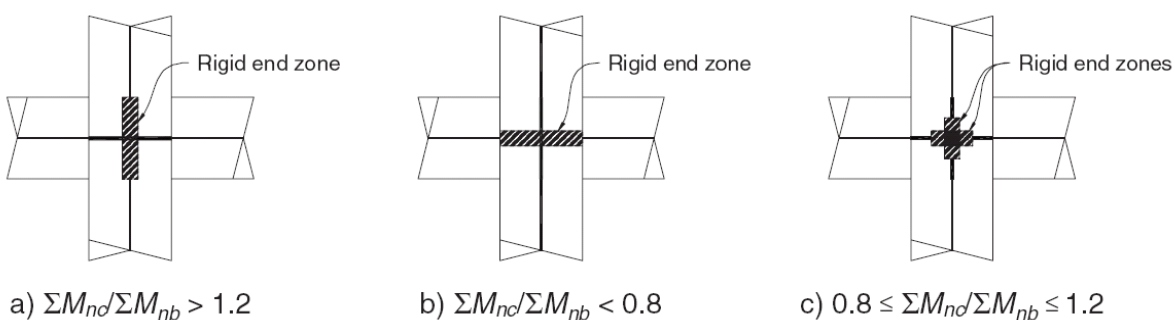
Recommended rigid end zone offsets for reinforced concrete beam column joints based on relative column and beam strengths (Elwood et al., 2007).
